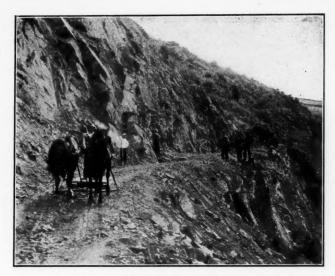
CONSTRUCTING ROAD ON LOOKOUT MOUNTAIN.
